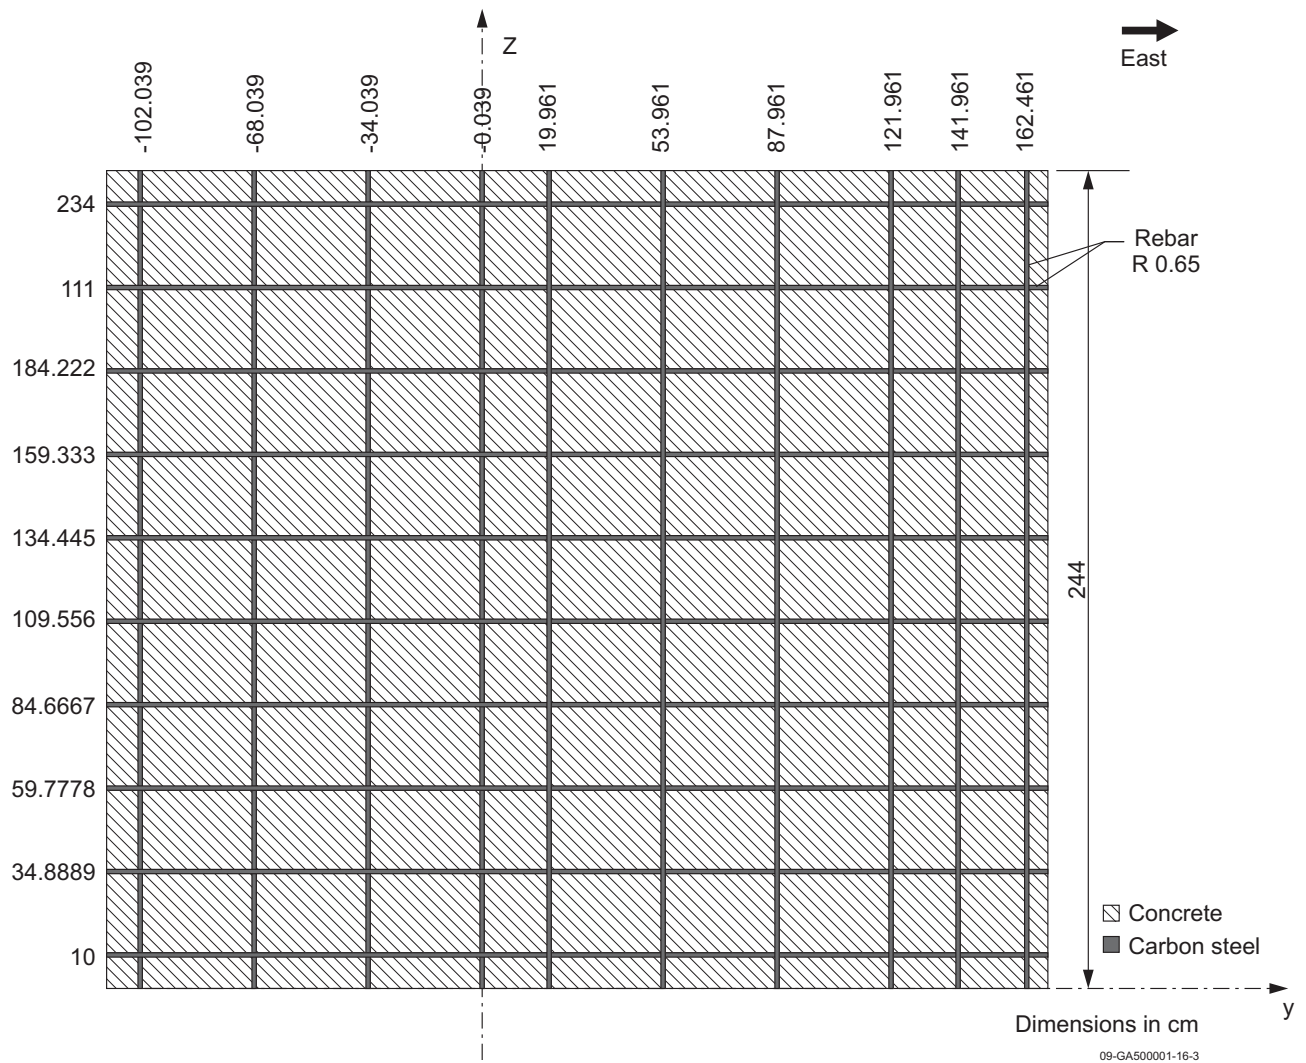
Detailed Model, South Side Enclosure Panel Showing Rebar Positions.
